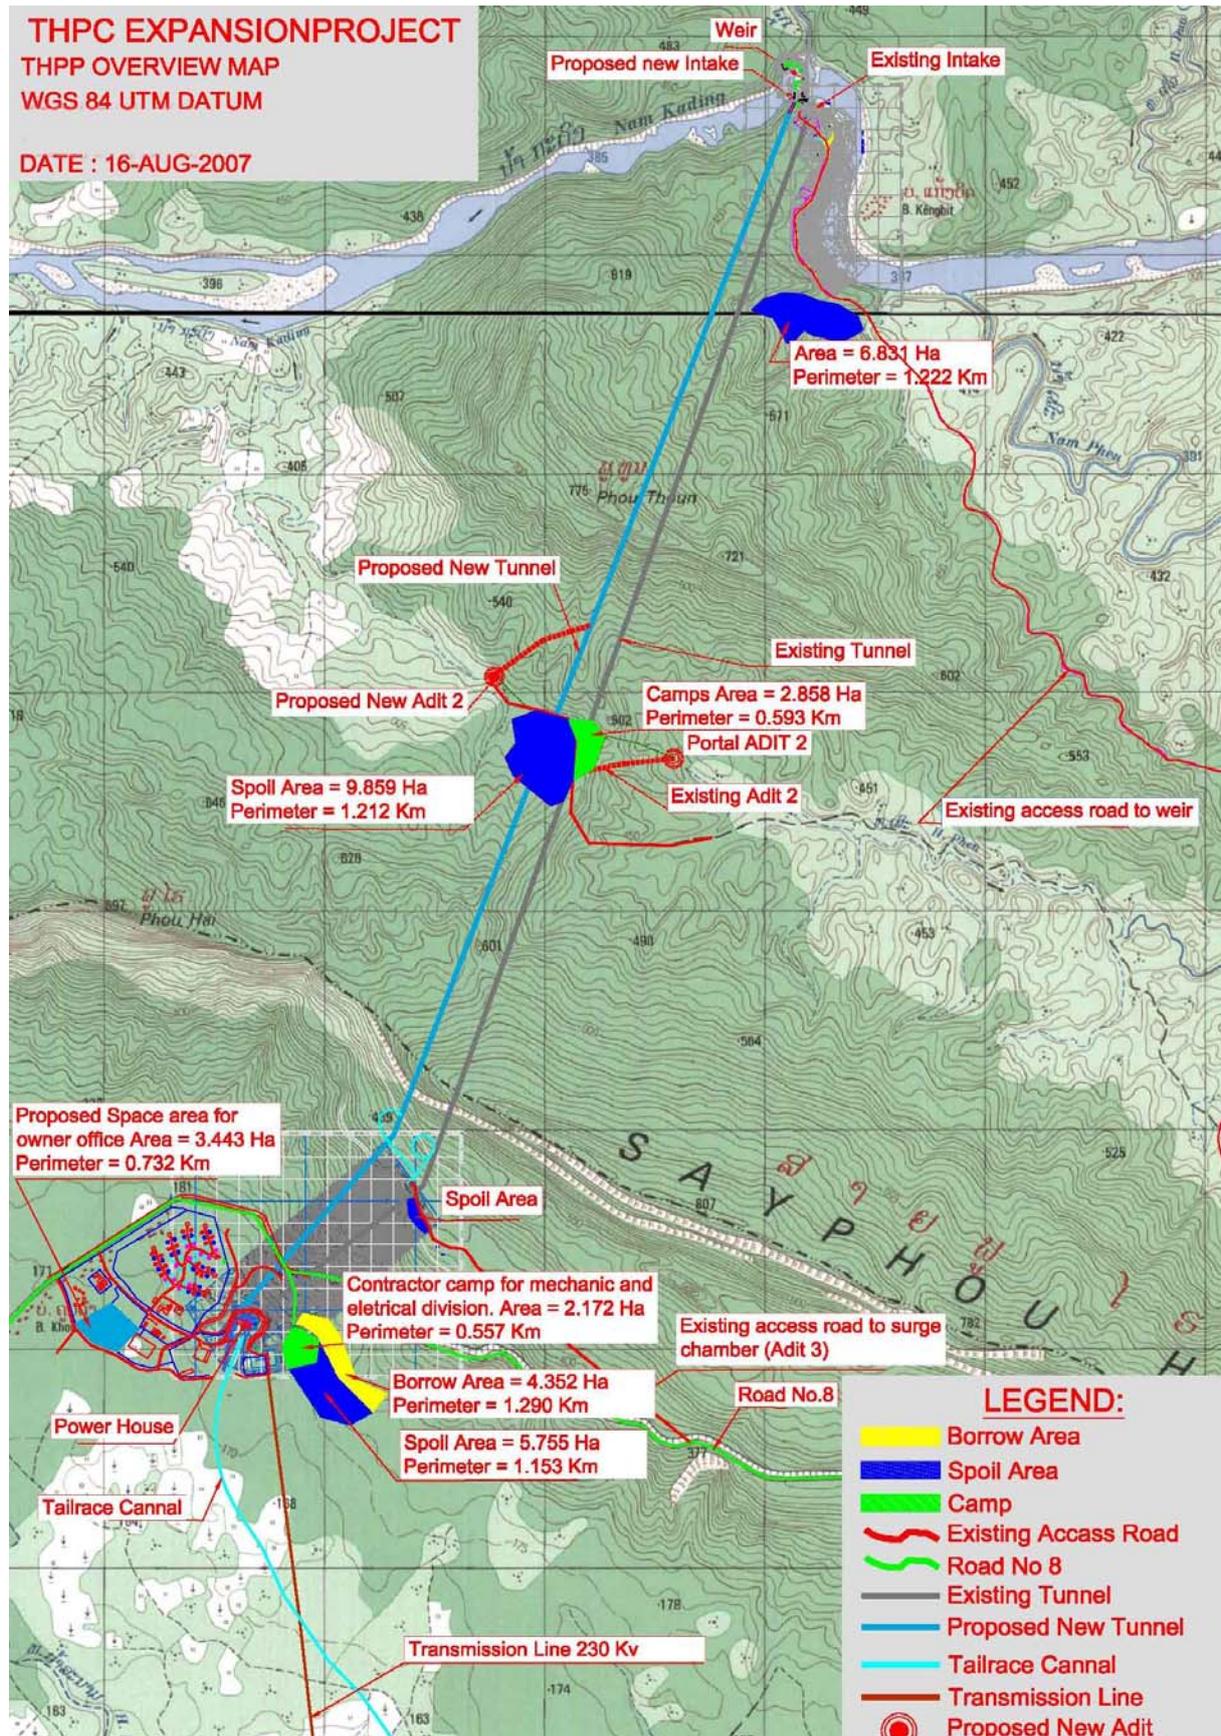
Location of Intake, Diversion Tunnel, Adits, Roads and Spoils for THXP.
